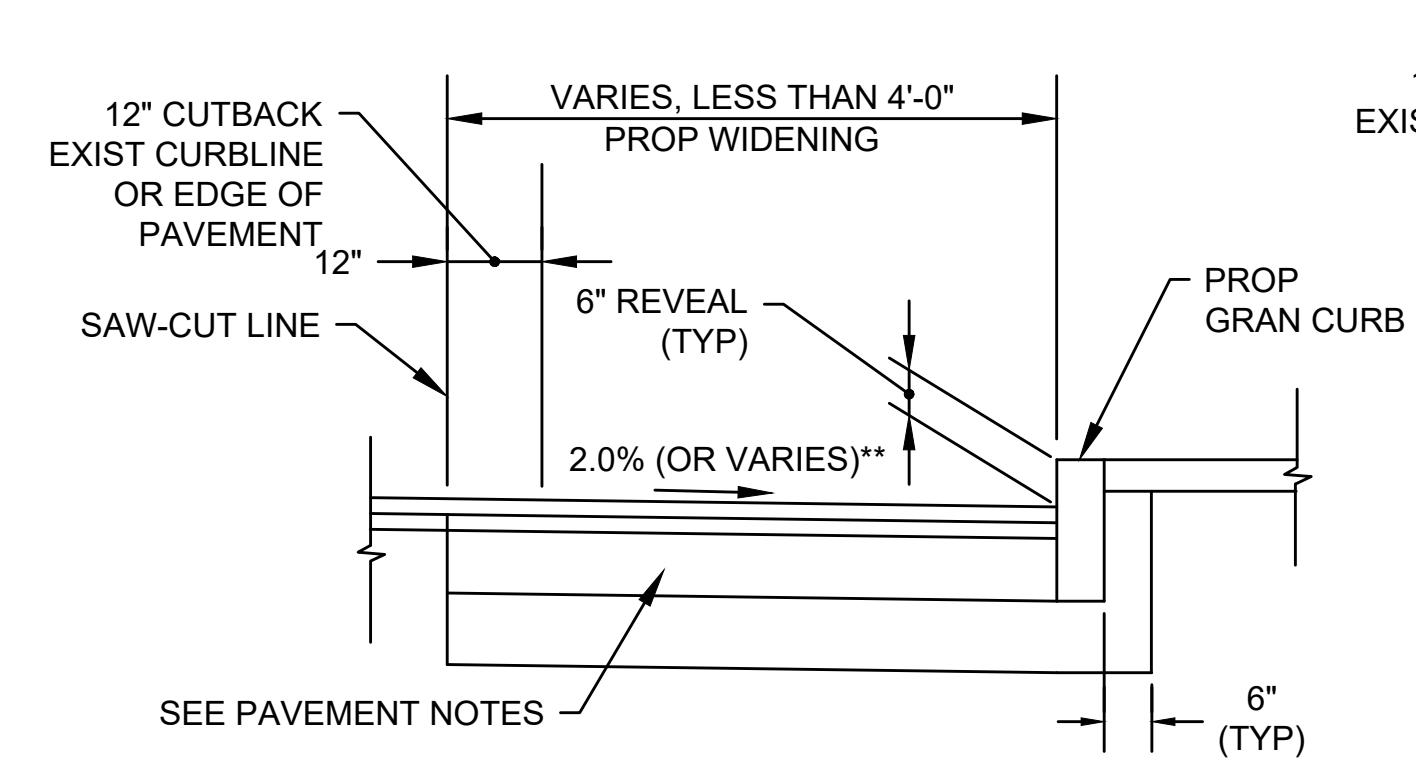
DETAIL FOR PAVEMENT TRANSITION AT LIMIT OF WORK
